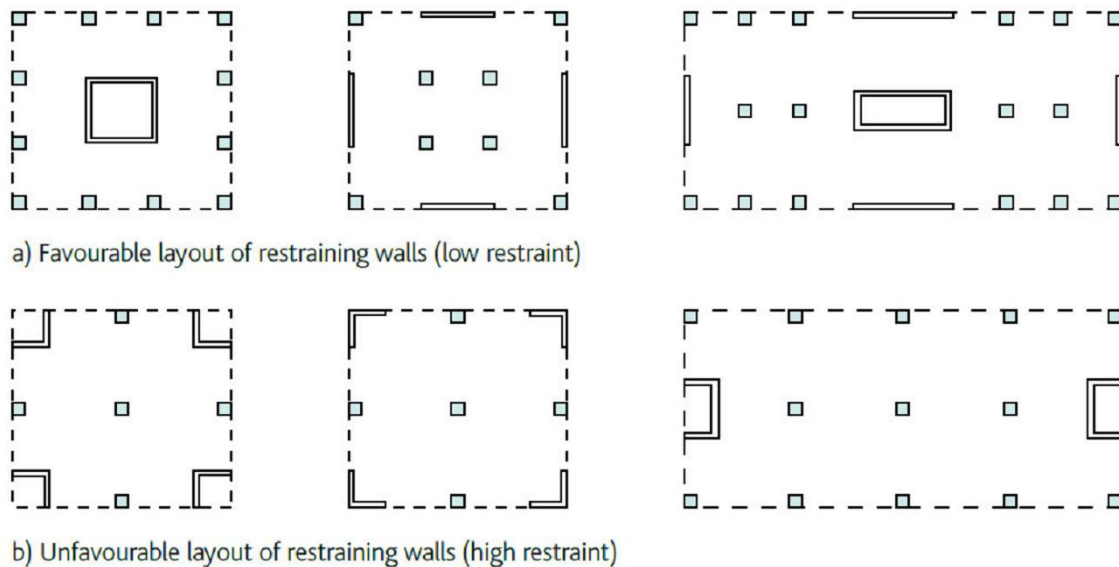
Typical favourable and unfavourable layout of restraining walls
